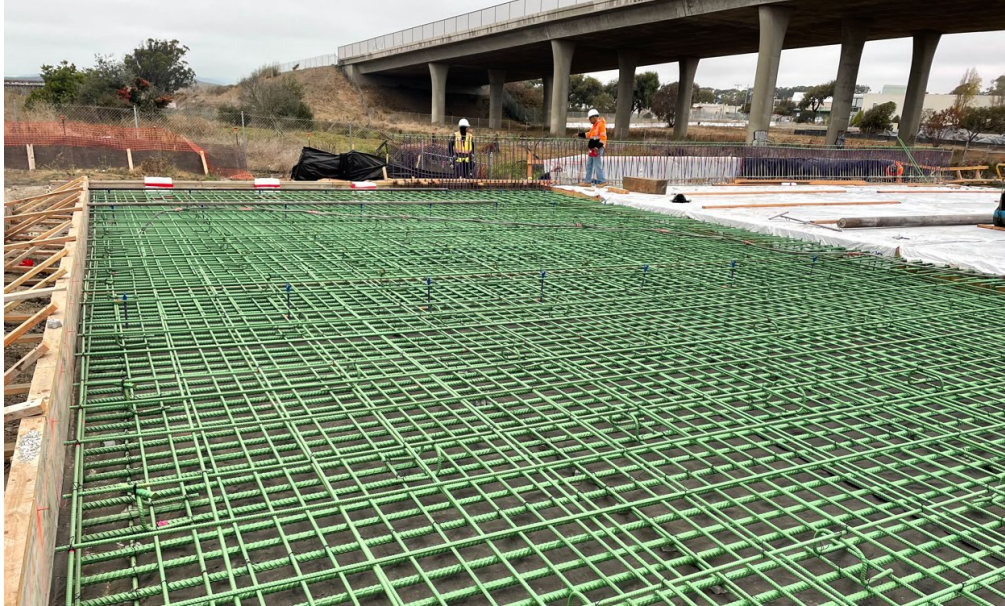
Epoxy-Coated Reinforcement (Green)
